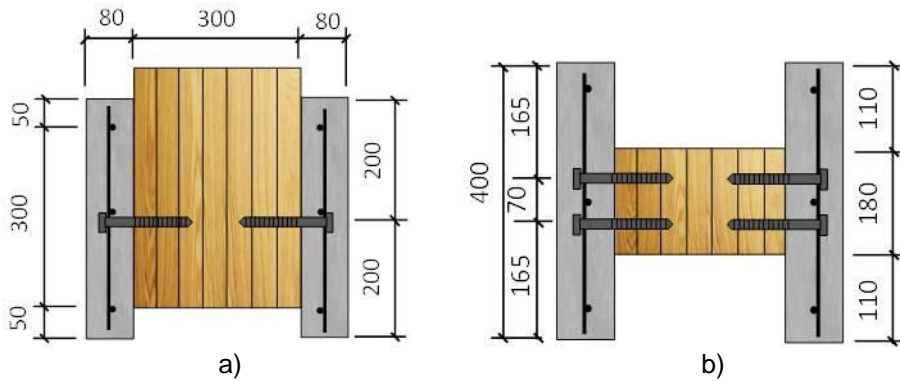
Details of push-out specimen (mm): a) front view of specimen, and b) top view of specimen
